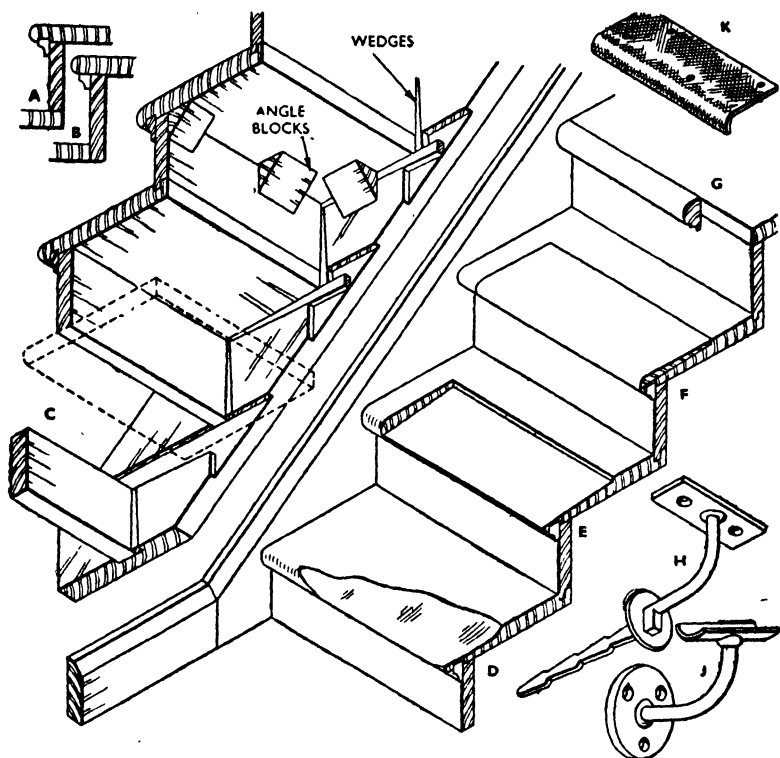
Stair construction showing how treads and risers are housed and wedged into the strings. A. Risers butted between the treads; B. cheap construction where riser butts against the tread; C. how to slide a new tread into position; D. E and F. stages in patching a worn tread. G. solid member shaped to the profile of the nosing and scotia moulding; H. metal bracket driven into wall to support handrail; J. metal bracket screwed on wall to support handrail; K. non-slip tread cover.
